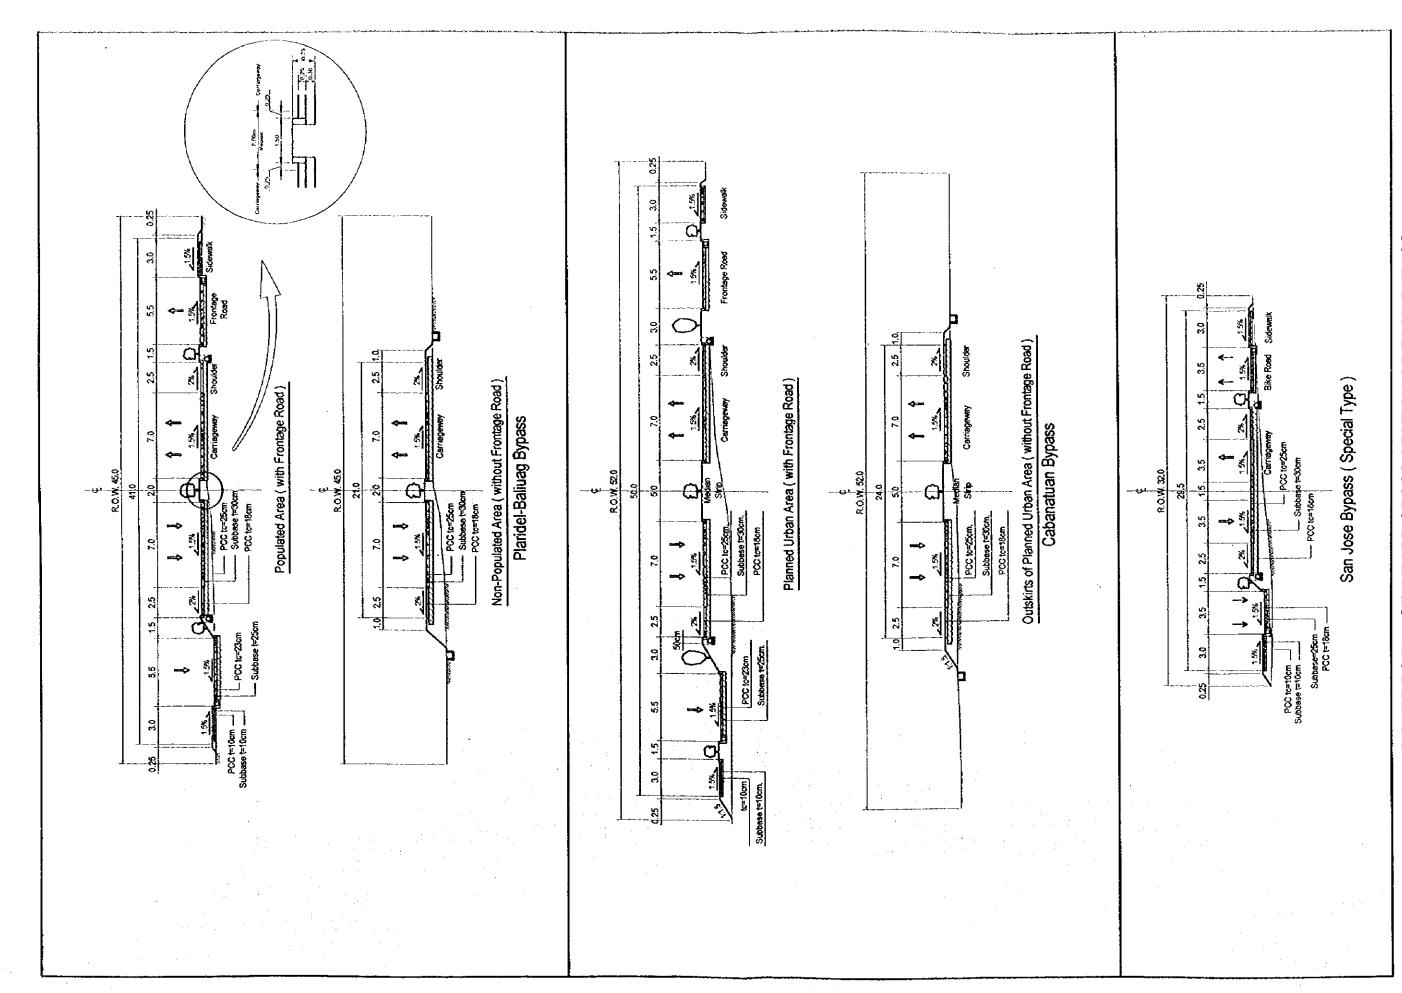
STANDARD CROSS SECTION OF EACH BYPASS
